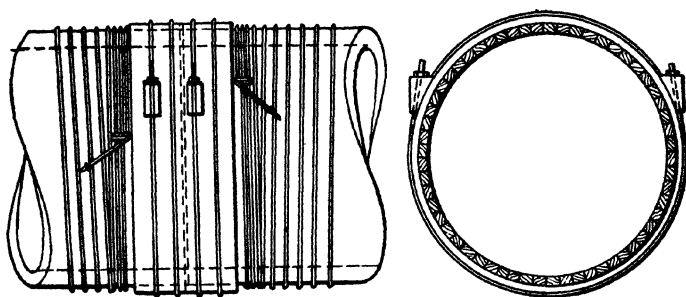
Typical Banded Collar for Wire-wound Pipe.
